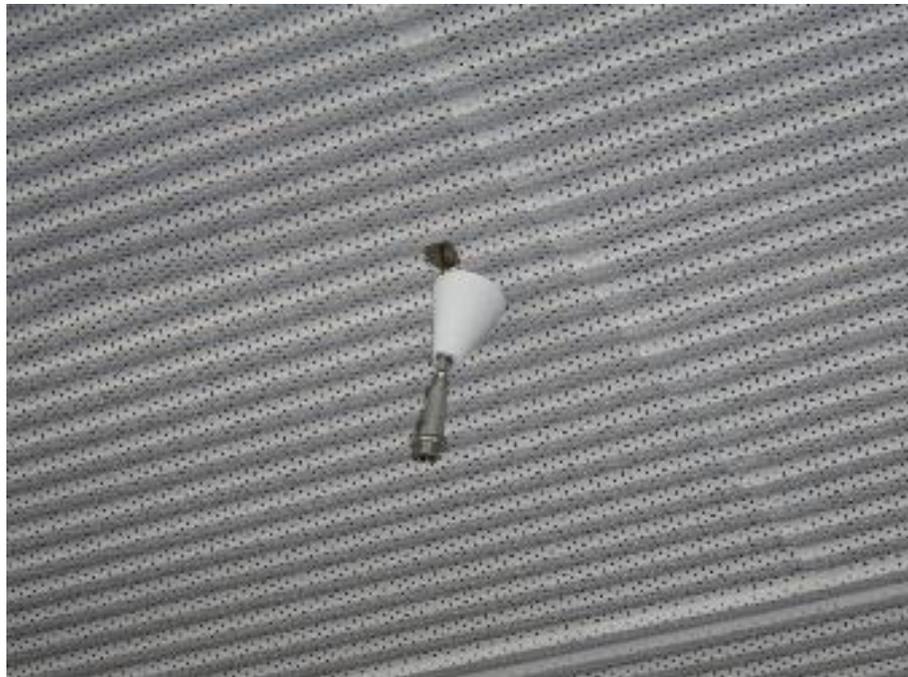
Aircraft cable slipped out of the cable gripping support fixture at Pueblo Vista Elementary School (photo by Quattrocchi Kwok Architects).
